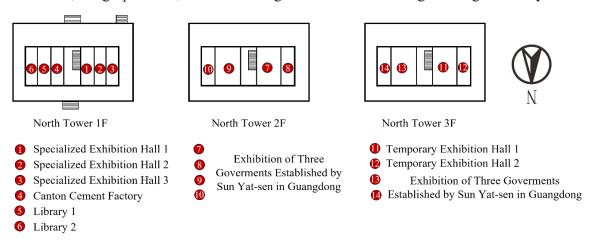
Floor Plan of the North Building of the Sun Yat-sen Grand Marshal Mansion Memorial Hall (Source: Self-Drawn by the Author)
